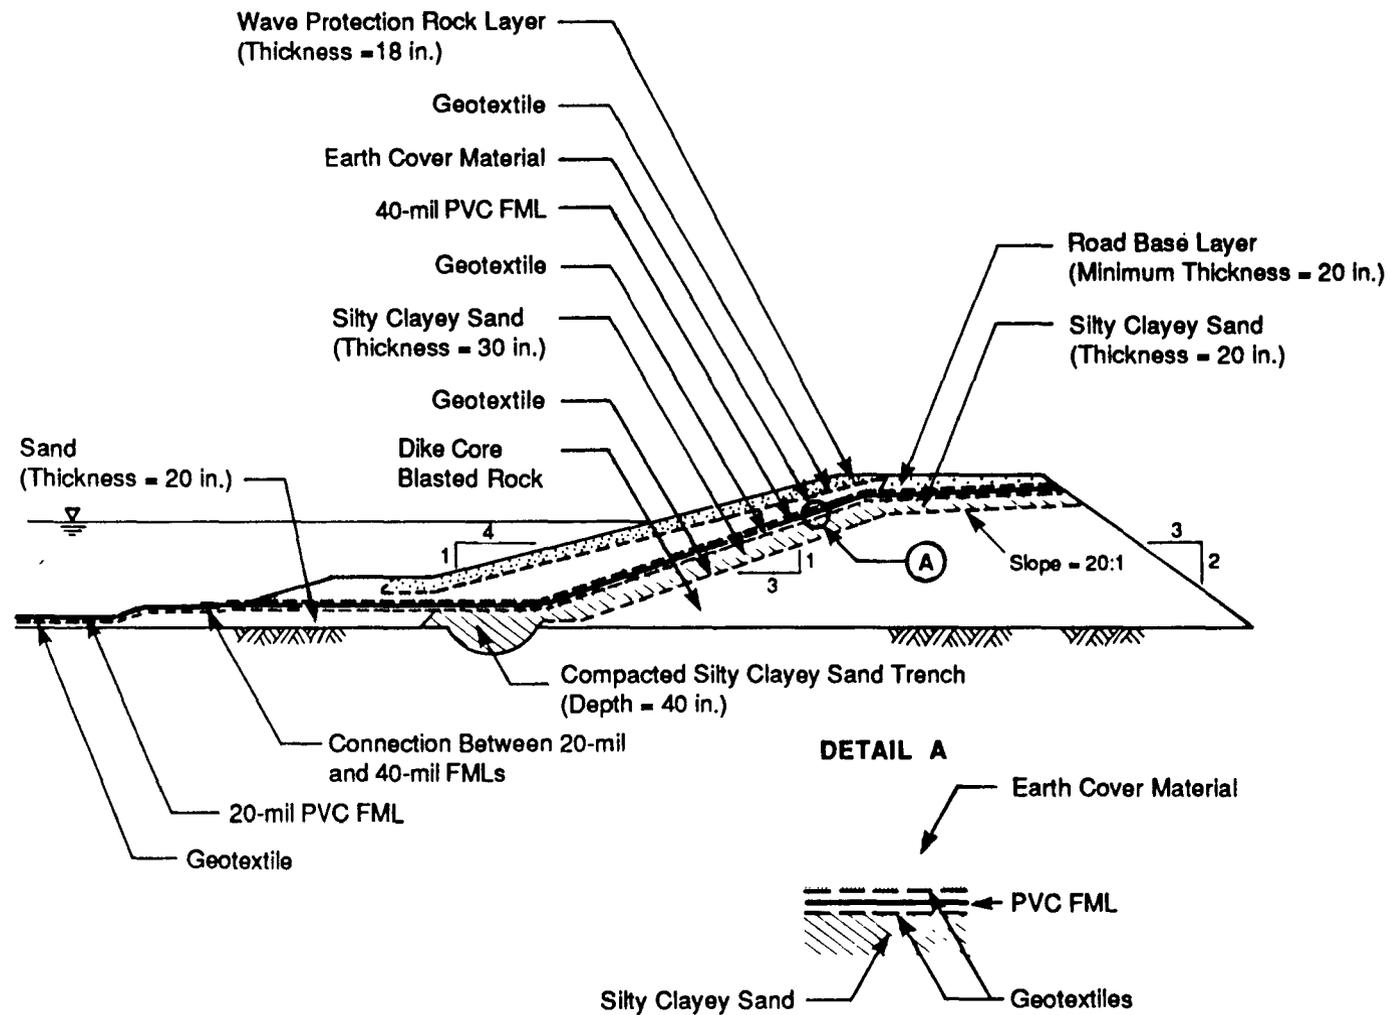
Typical cross section of the dike for a uranium-tailings pond--Pond 10 (not to scale). (Based on Giroud 1984a).
